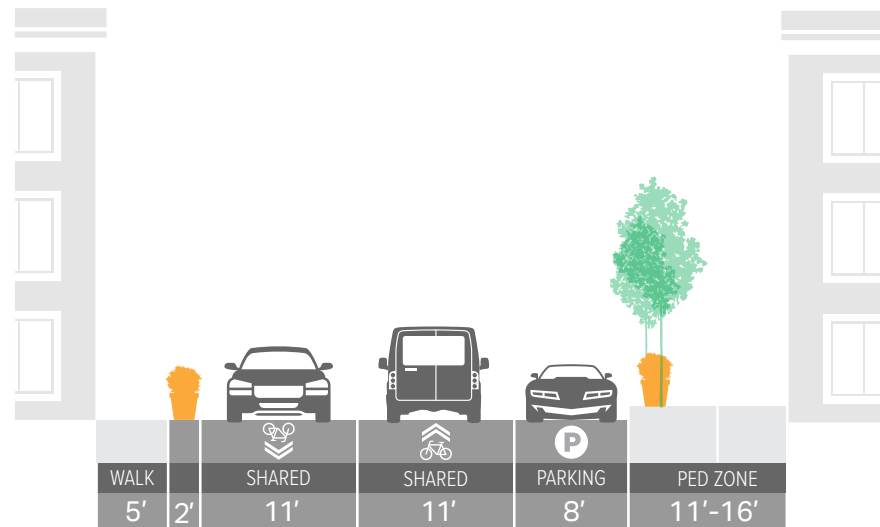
Proposed Cross-Section Washington Avenue to Dart Street
